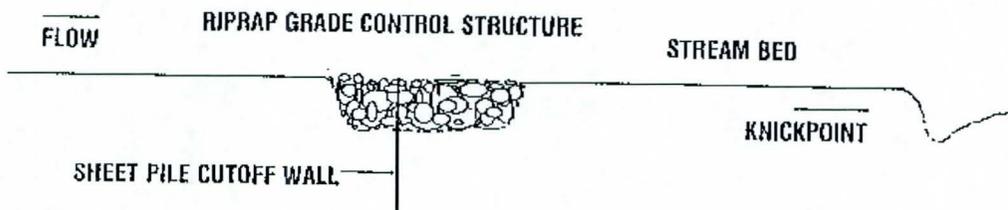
As-built riprap grade control structure with sheet pile cutoff wall.
